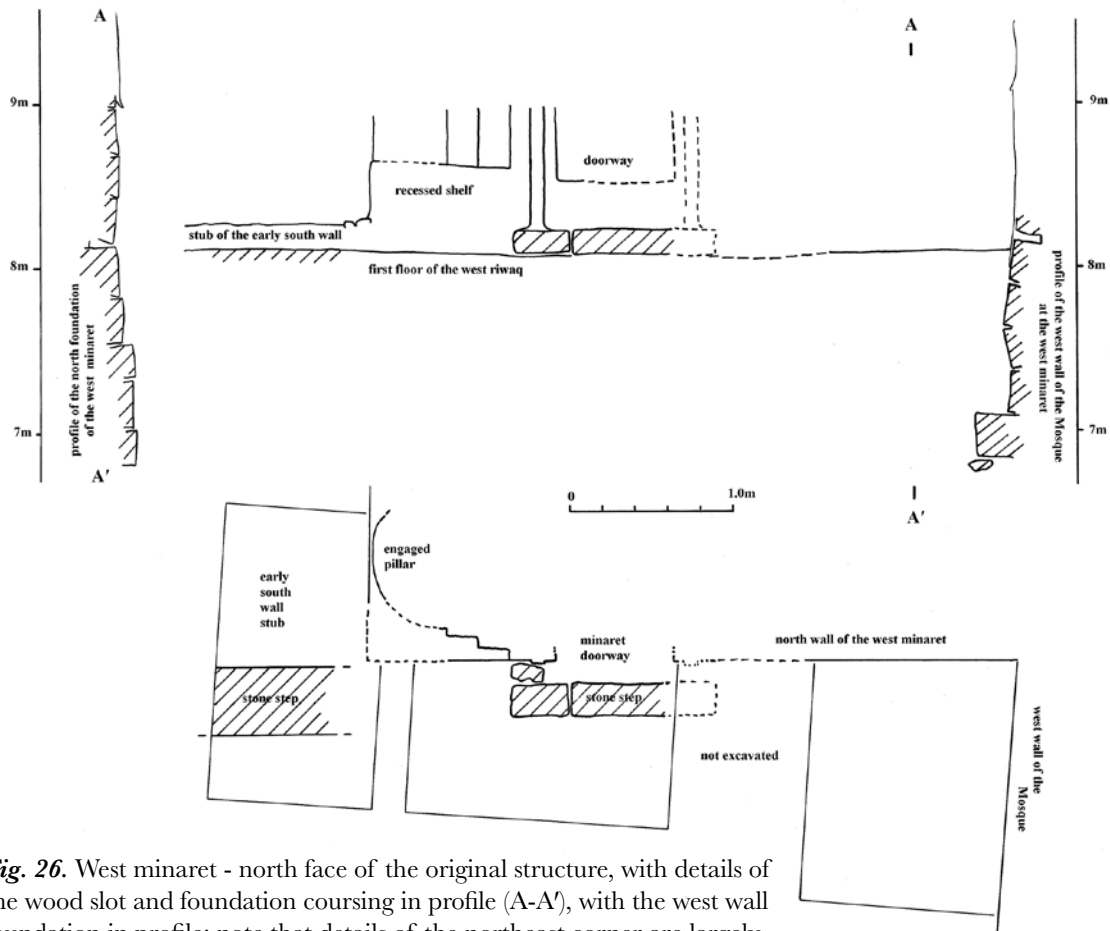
West minaret - north face of the original structure, with details of the wood slot and foundation coursing in profile (A-A'), with the west wall foundation in profile; note that details of the northeast corner are largely hidden by the rubble piling inserted to reinforce the pillar A14 foundation.
